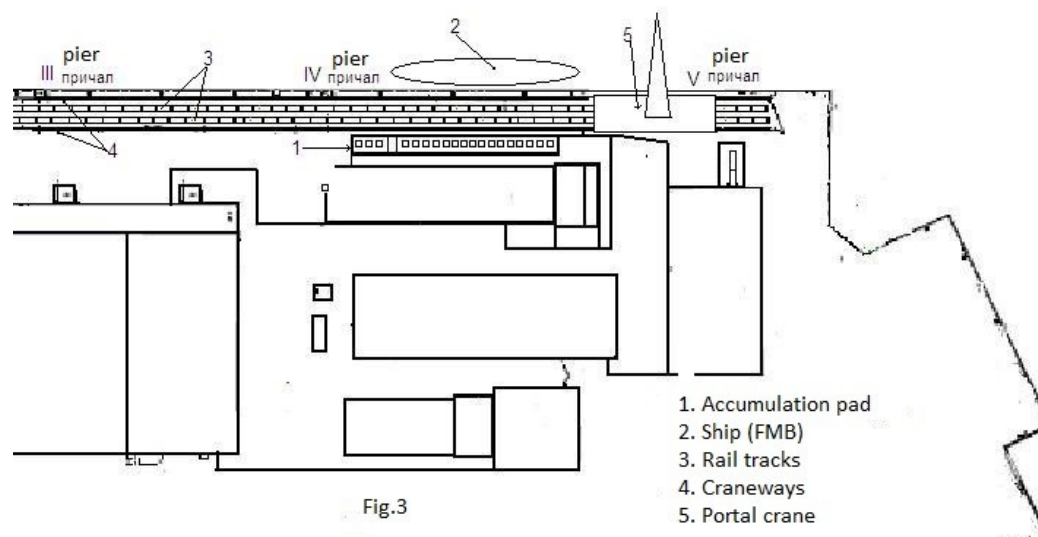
Layout of SNF handling facilities at FSUE Atomflot.
